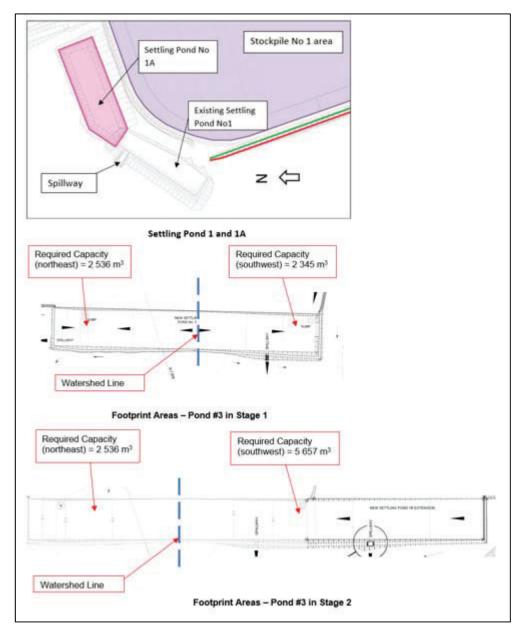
shows both the existing Pond No.1,1A and Settling Pond 3 stage 1 & stage 2 compartments.
